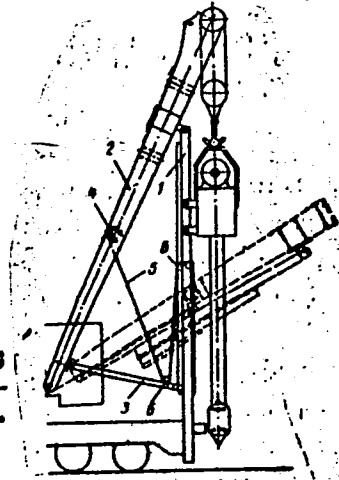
1 - pile-driver boom; 2 - crane boom; 3 - brace; 4 - drive; 5 - cable; 6 - pulleys.
